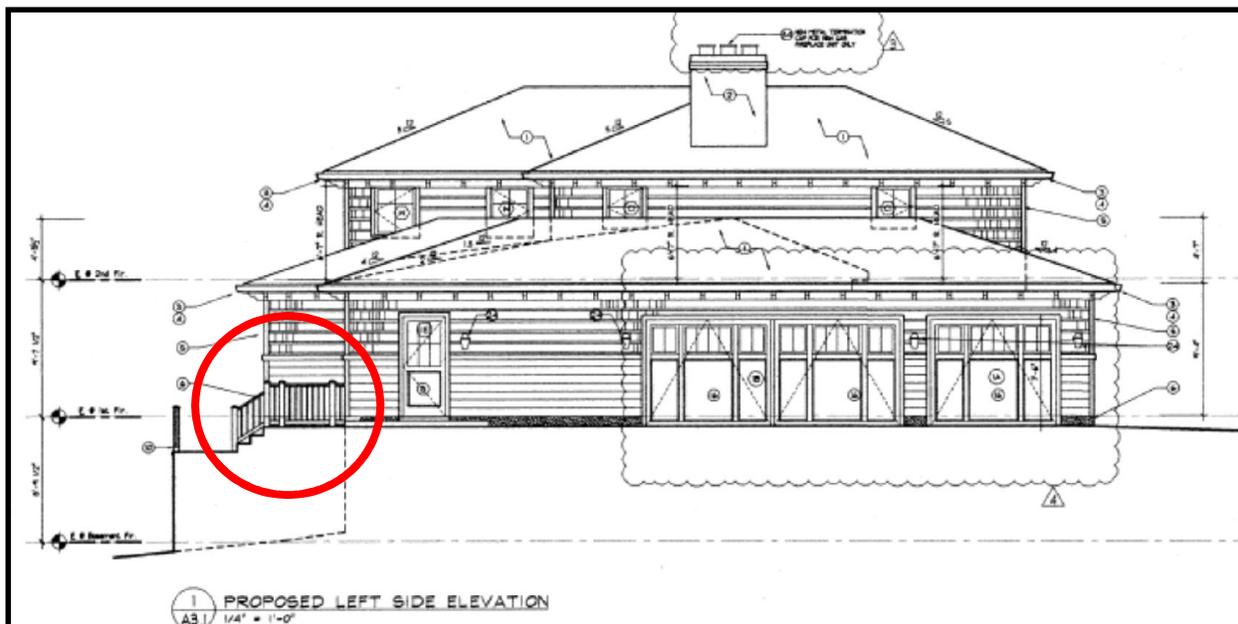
South side elevation, with ADU stairway access circled. Source: Applicant.
